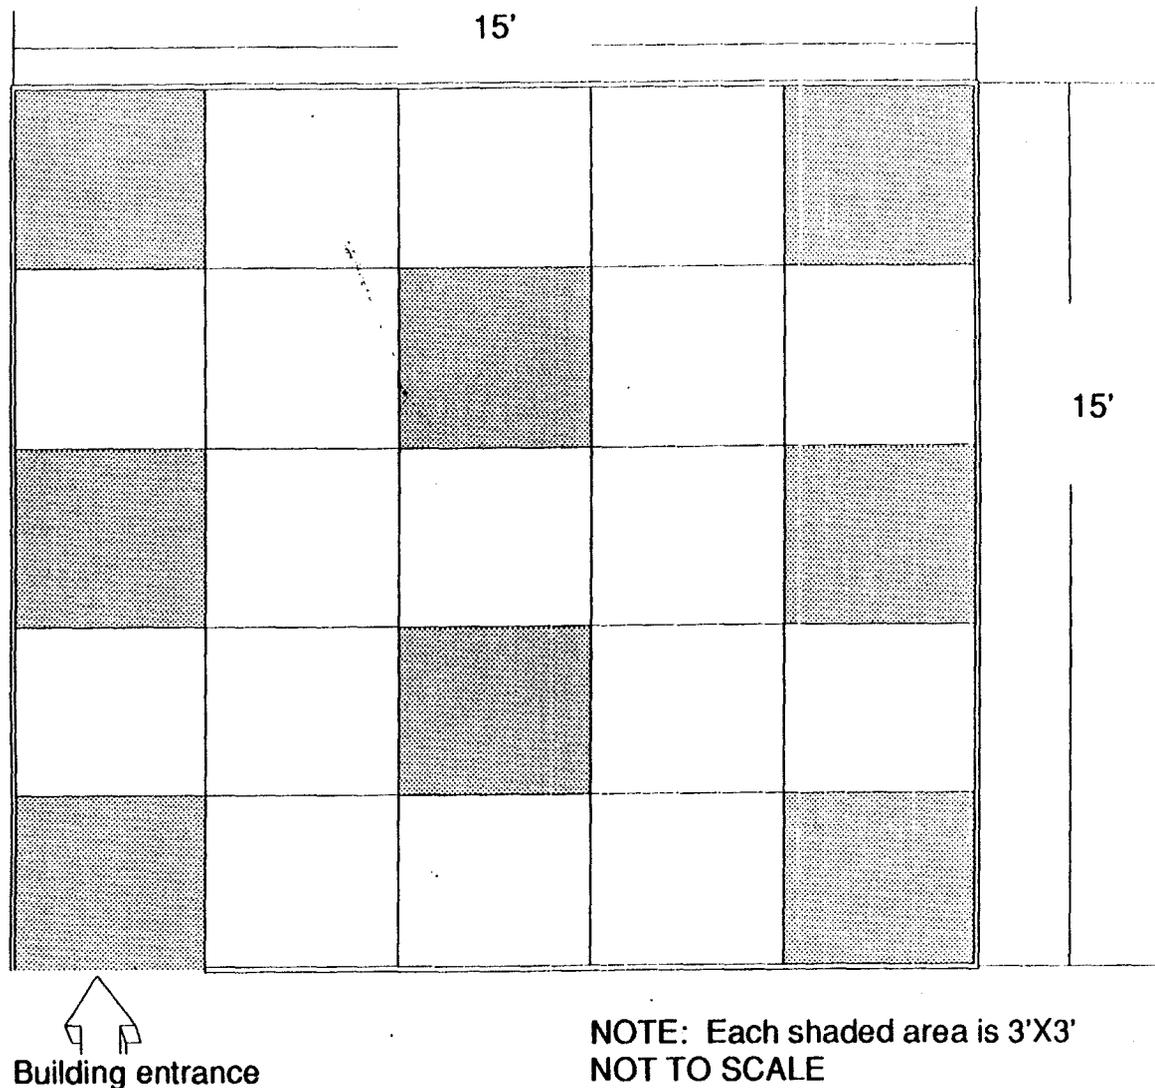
Wipe Sample Locations (shaded area) of Concrete Slab at Building 121
